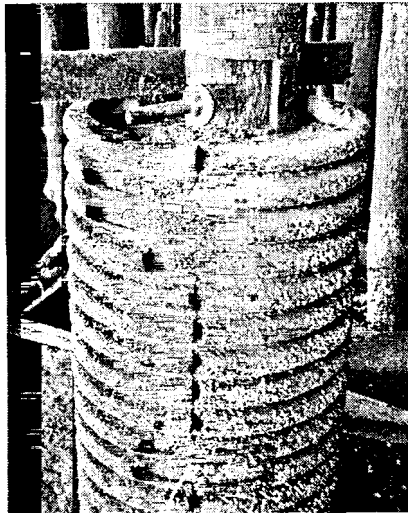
Repair Method using of HDPE Pipe Encasing and Splicing with Steel Bolts.
